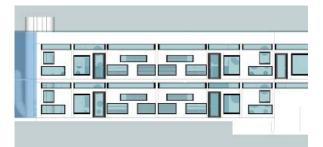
THIRD PROPOSITION OF WINDOW PATTERN.
